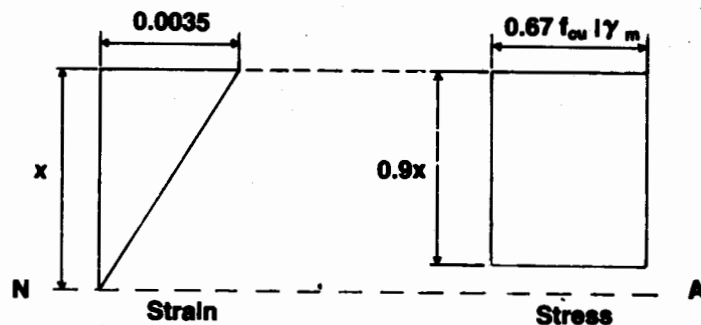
Simplified stress block for concrete at ultimate limit state
